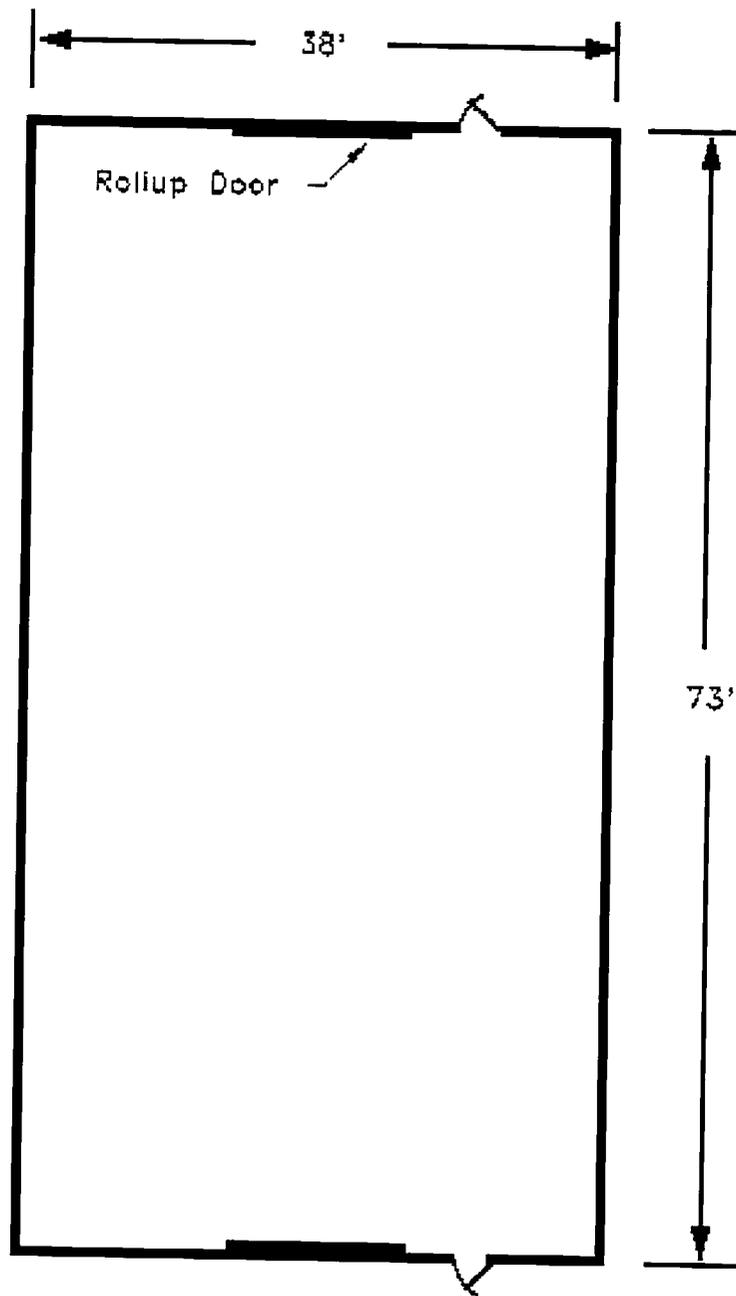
SWSA 6 Staging Facility, Building 7878.
